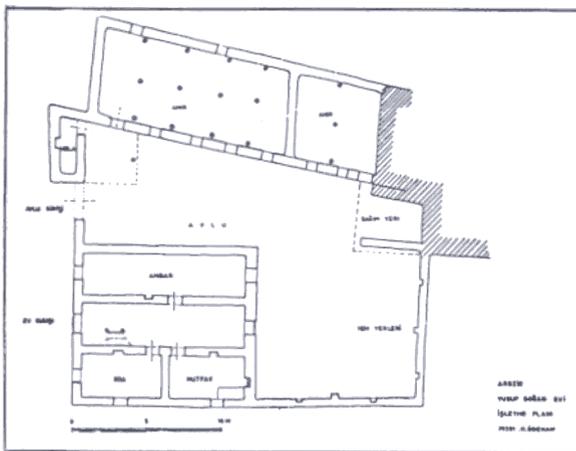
Lower floor plan including the courtyard and outbuildings of Yusuf Doğan's house (A. Alpöge).
